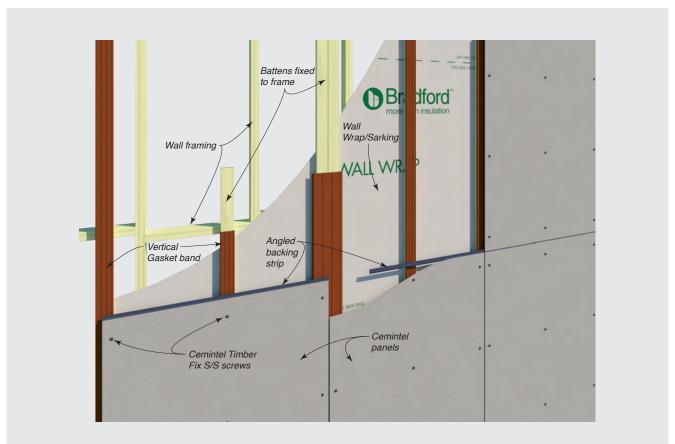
Barestone External and Surround on Timber Battens Overview
